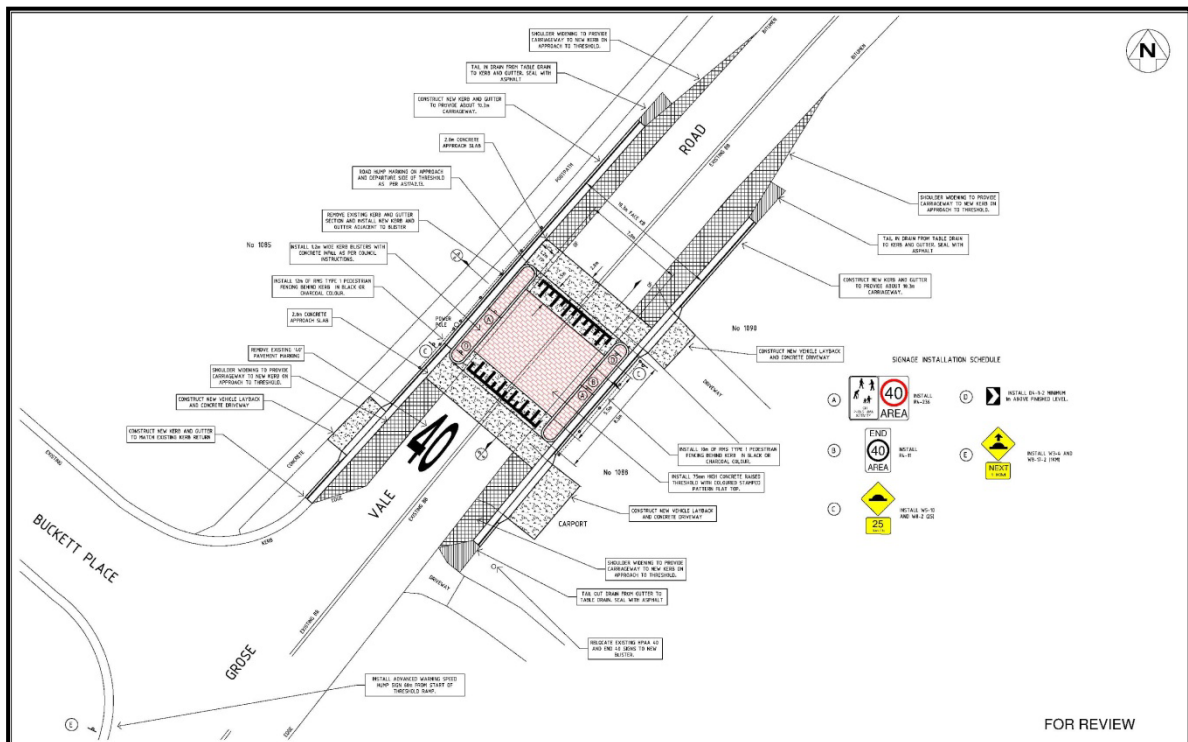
Site 1 – Proposed Raised Threshold Gateway Treatment
